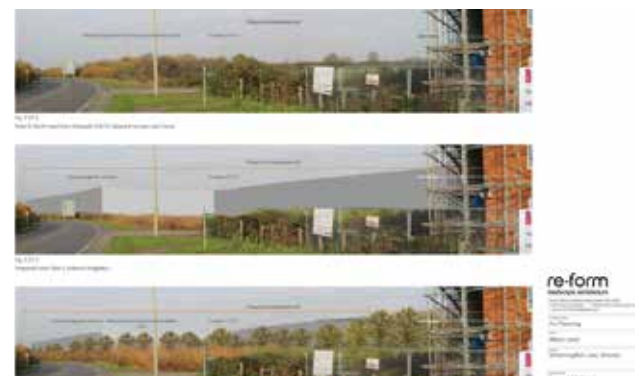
LVIA the proposed buildings in grey to Skimmingdish Lane adjacent to the care home
